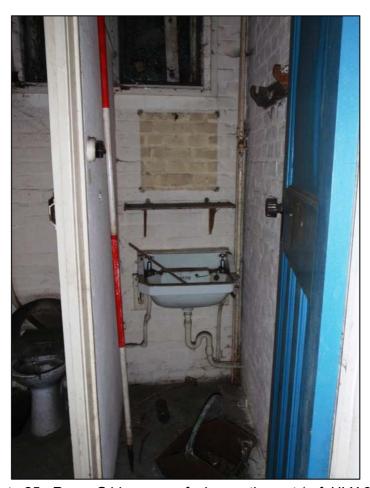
Room G11, camera facing north-west (ref. HLX 38)
